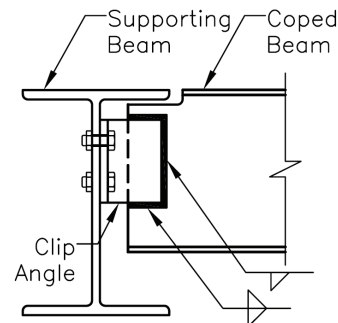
Schematic of coped beam with a welded clip-angle connection.
